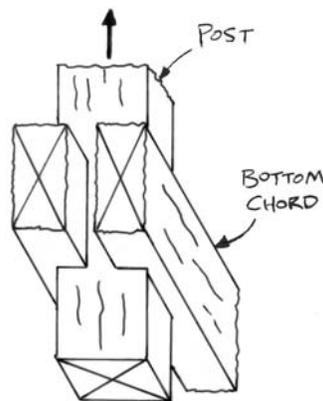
Typical Connection Between Notched Post and Bottom Chords.
